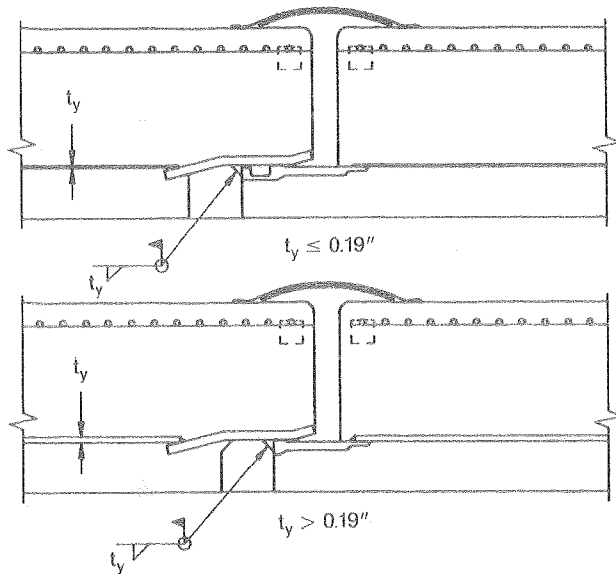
PCCP FIELD-WELDED JOINT DETAILS. For cylinder thicknesses of 0.19 inch or less, the concrete lining is held back at the bell during manufacturing to provide sufficient space for welding. For thicker cylinders, the grooved end of the spigot is cut off at the manufacturing plant as shown in the lower figure.
